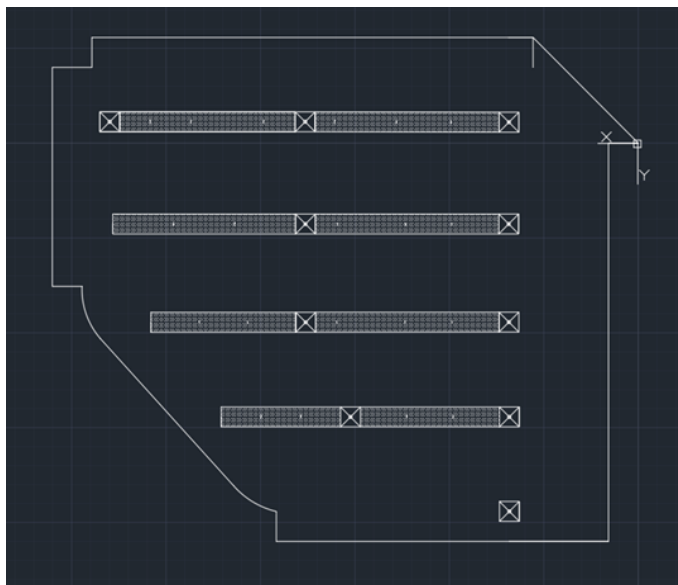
Drainage plan retrieved from Facilities & Services Department
